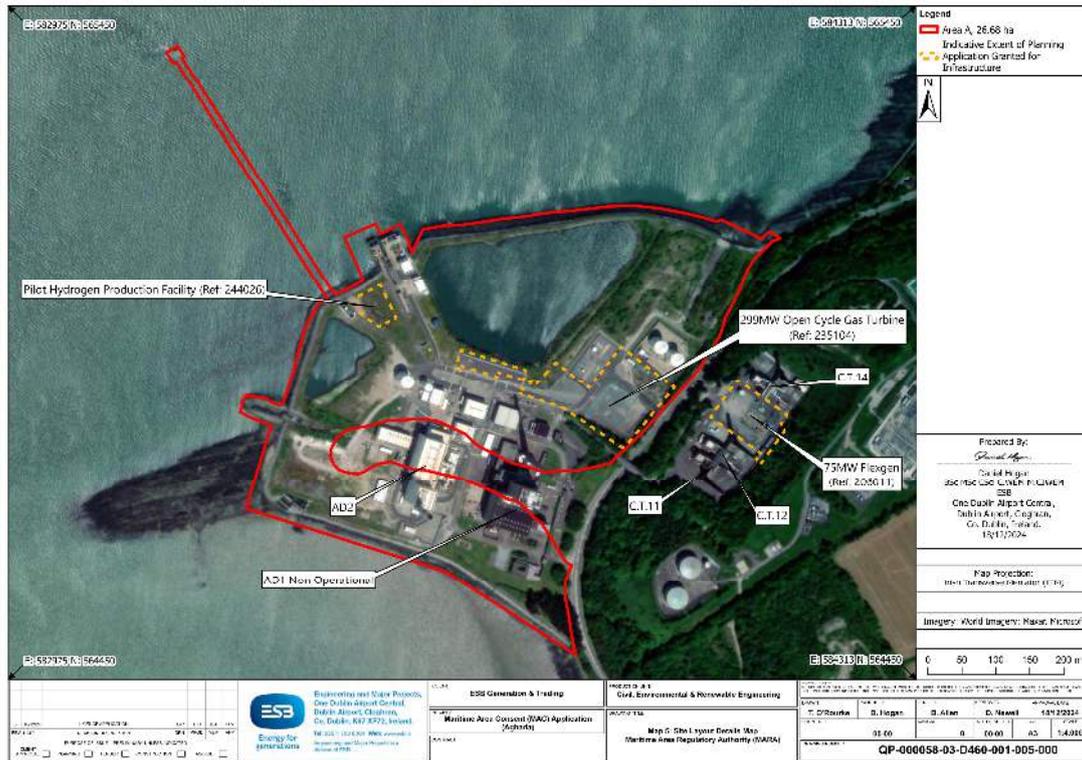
Proposed works with respect to overall site layout and existing infrastructure.
